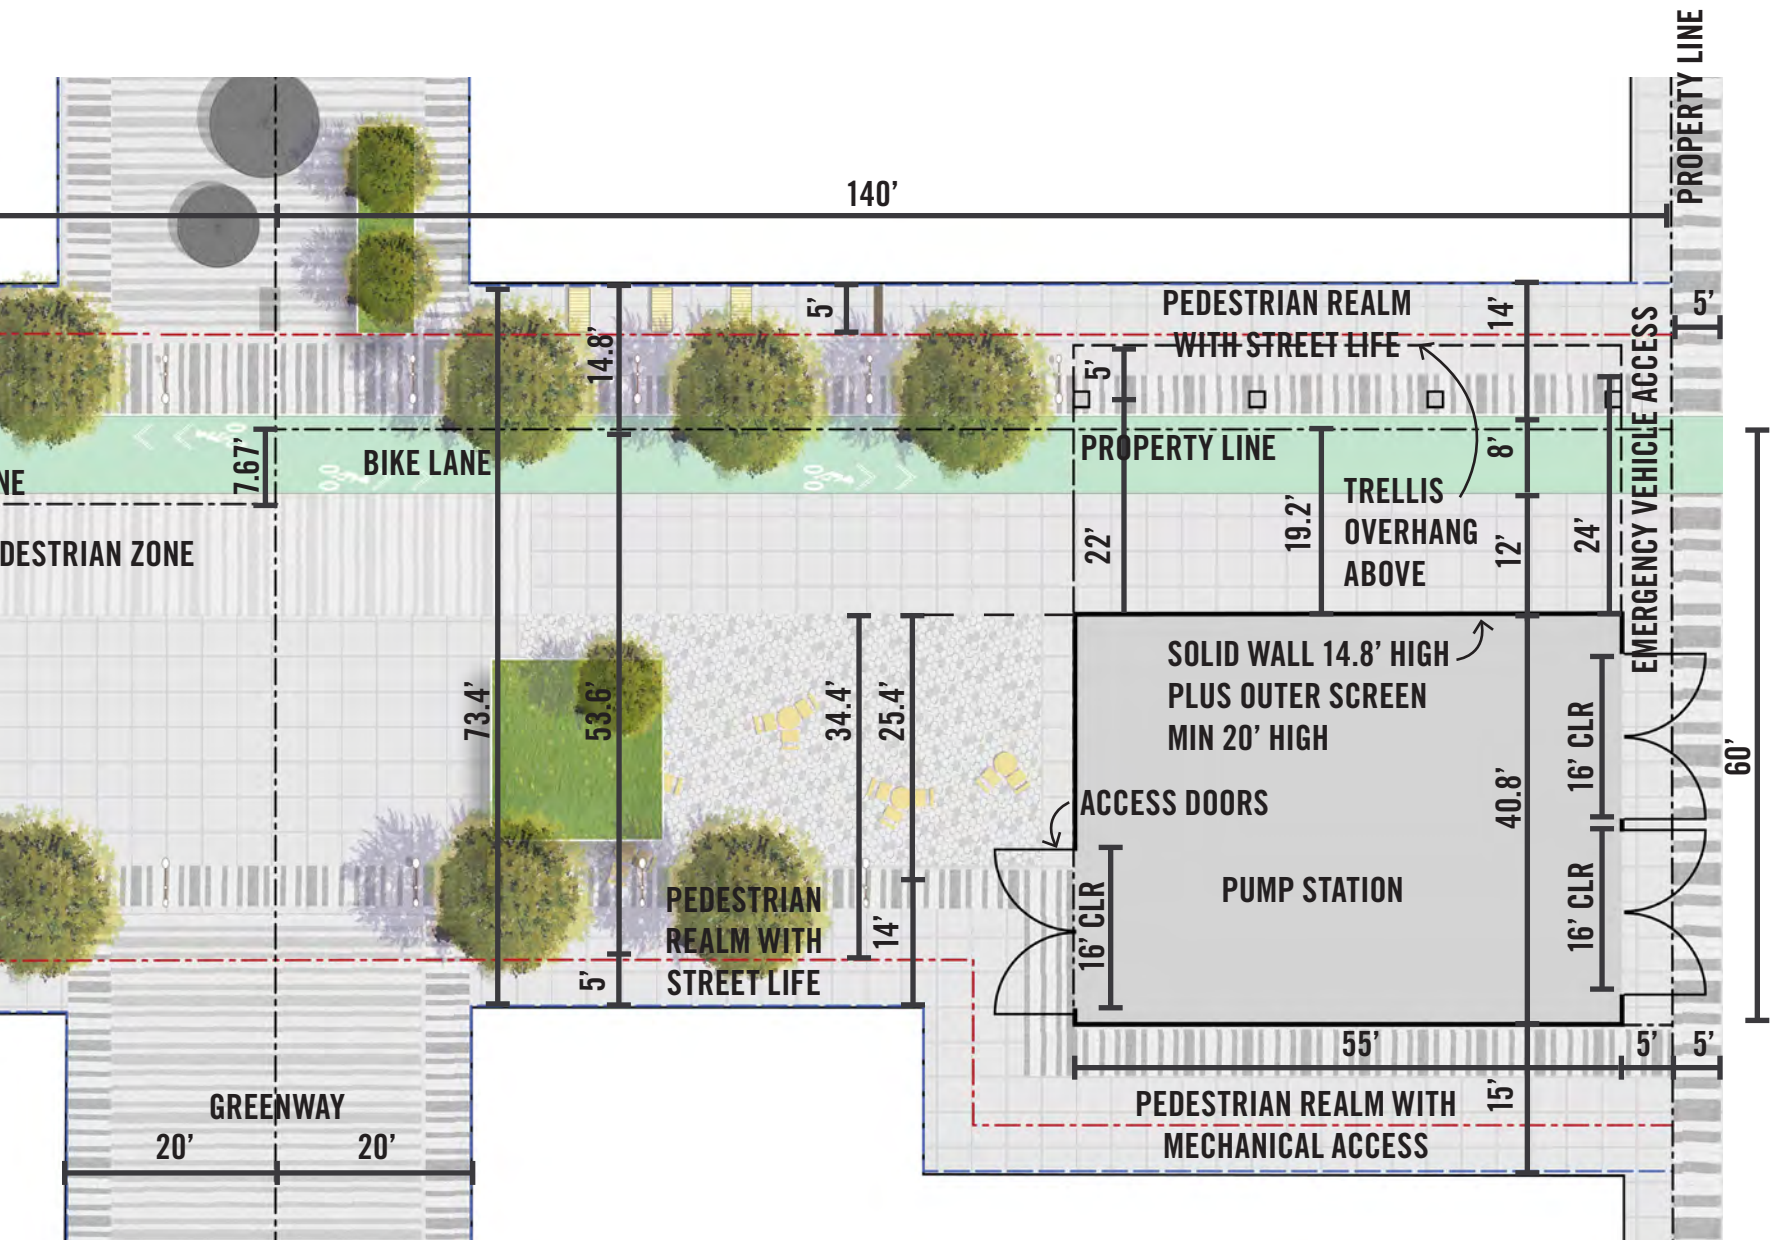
Calle Del Sol Street Plan: North of Calle de Luna
